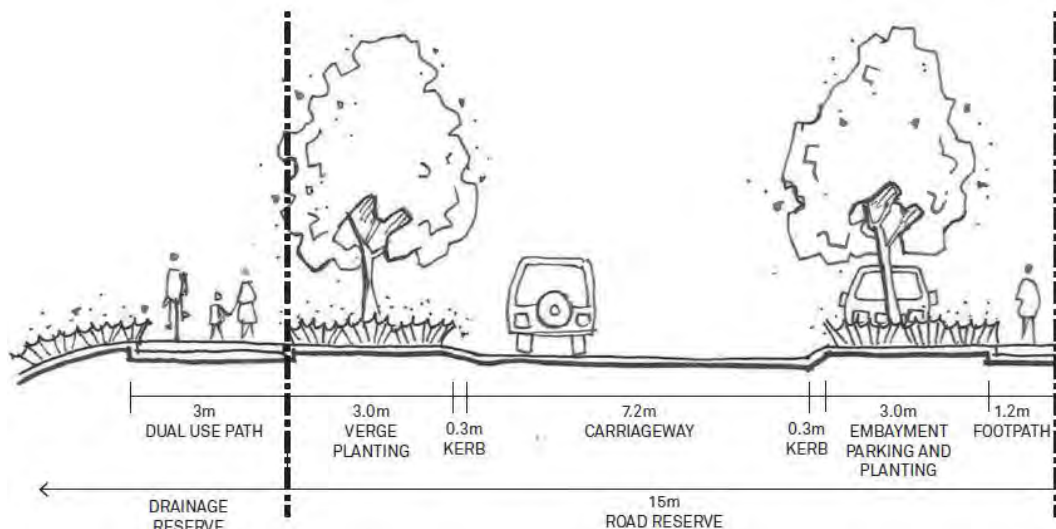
Road 8, Typical 15 metre cross section [Section (C)]
